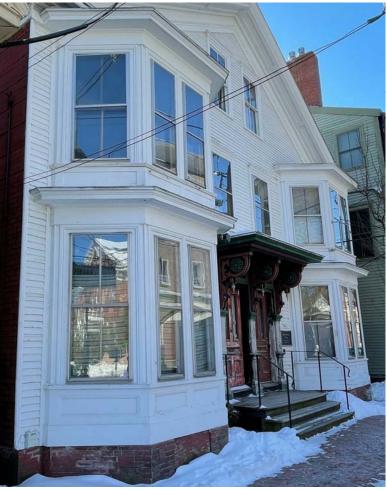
IMAGE OF EXISTING ENTRY AND BAY WINDOW TRIM/MOULDING DETAILS
